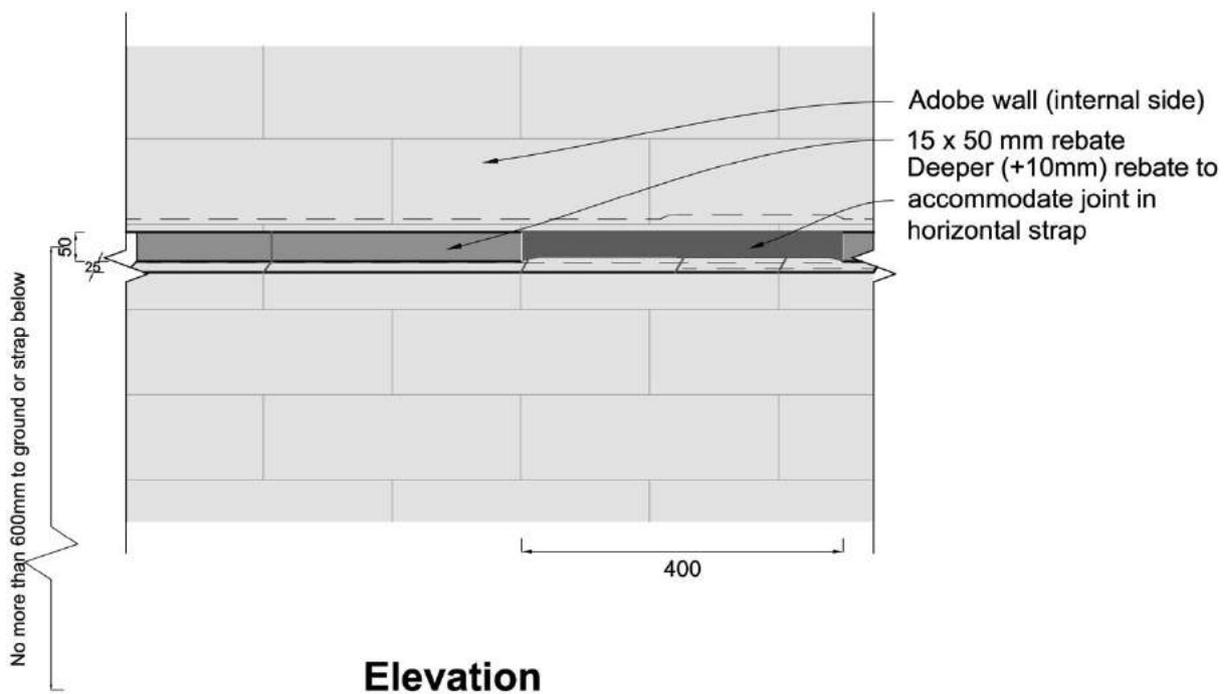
Horizontal straps wrap around the corner of an internal wall. Note the deepened length of rebate to accommodate the nailed joint of the strap. The position of the deepening should allow for easy strap tensioning of the joint, avoid clashing with a vertical strap running at right angles and be on the inside face of a wall to reduce the risk of corrosion.
